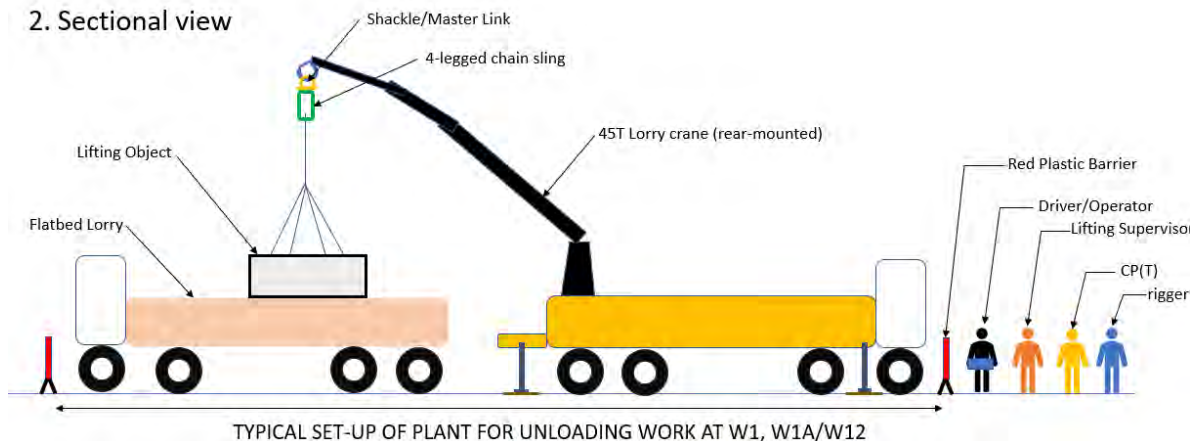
Site Set up and Logistic Arrangement during Foundation and Tower Crane Erection Stage (Viaduct Level)
